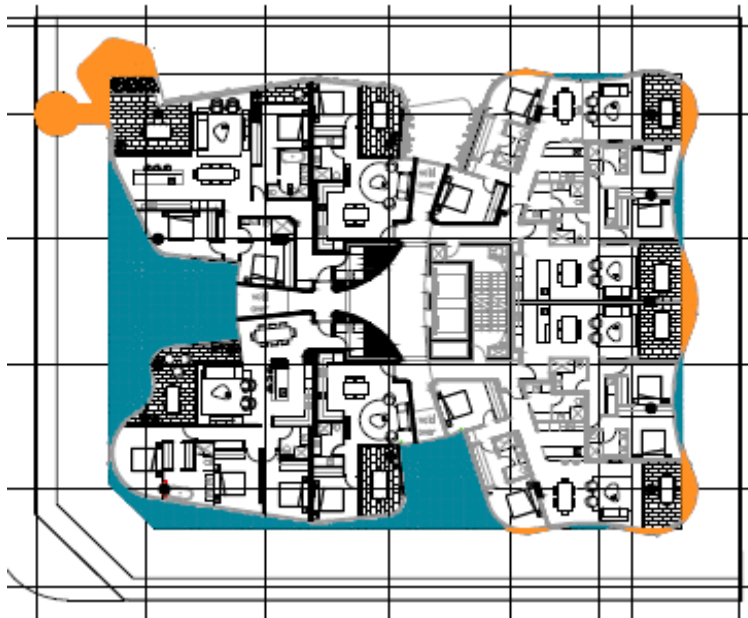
Kishorn Road and Forbes Road (Ground Floor) Setback Encroachments in Orange and open (compensating) area in Blue
